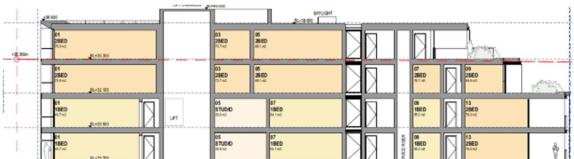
Section showing extent of Height of Building exceedance (Source: Applicant's Section 4.6)
